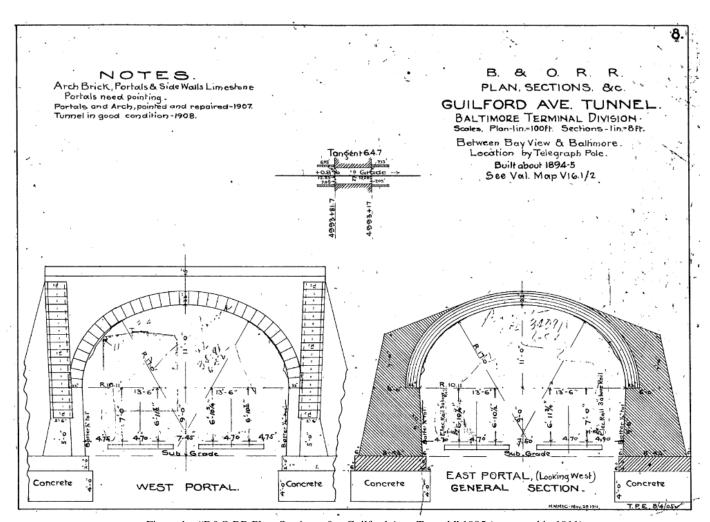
"B&O RR Plan, Sections, &c. Guilford Ave. Tunnel," 1905 (annotated in 1911).
